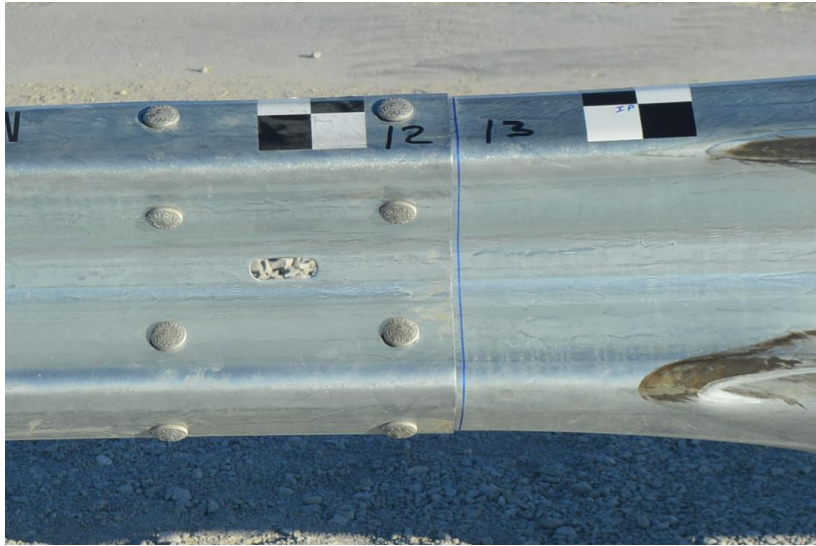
System Damage, Guardrail at Post Nos. 12 through 14, Test No. MGSC-8
